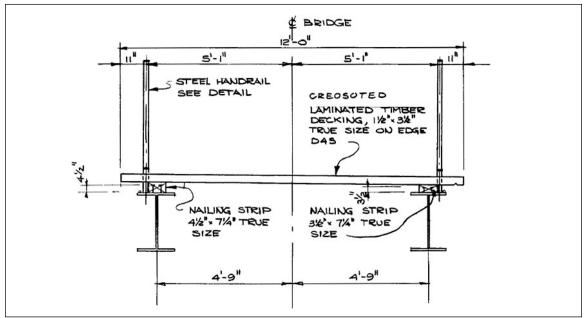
A typical section of the deck shows the relationship of the girders to the decking and handrail [Albery, Pullerits, Dickson & Associates Ltd., 1973].
